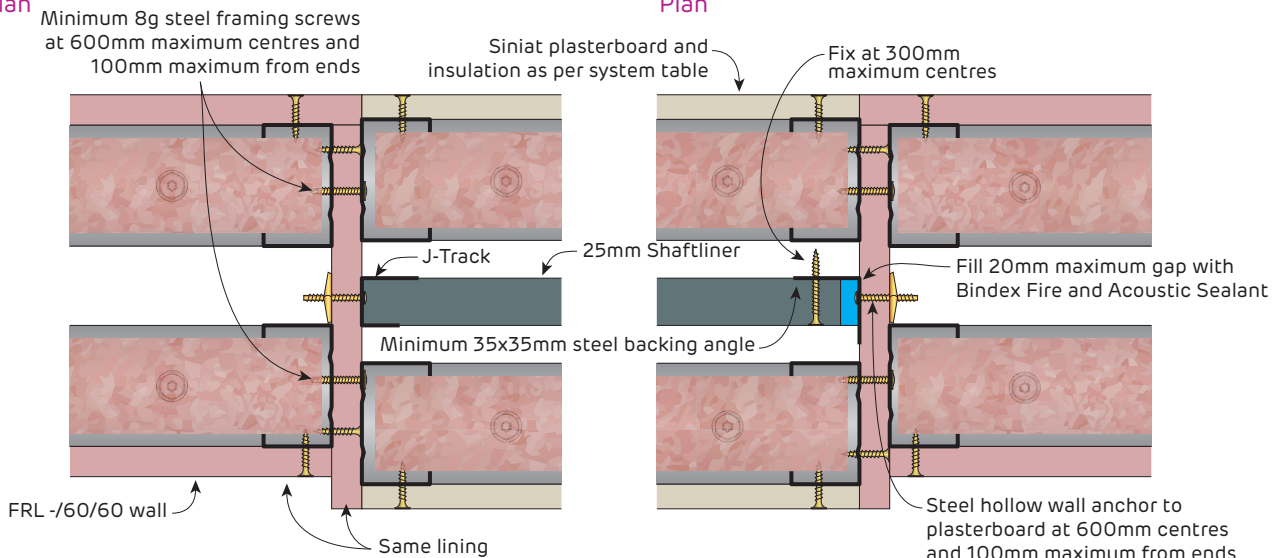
InterHome High-Rise Wall Transition to Double Stud Fire Rated Plasterboard Wall
